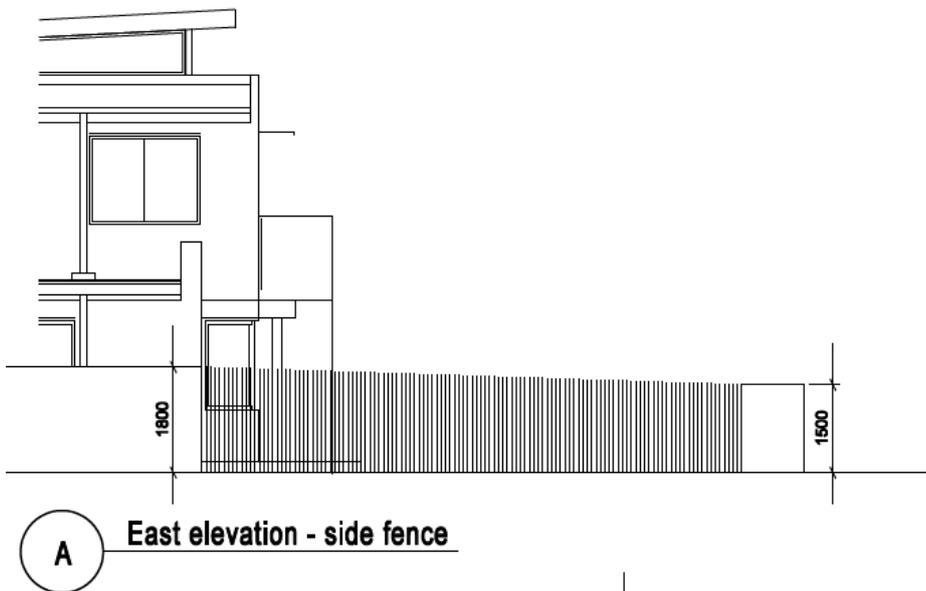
Eastern (side) elevation of the proposed side boundary fencing.
